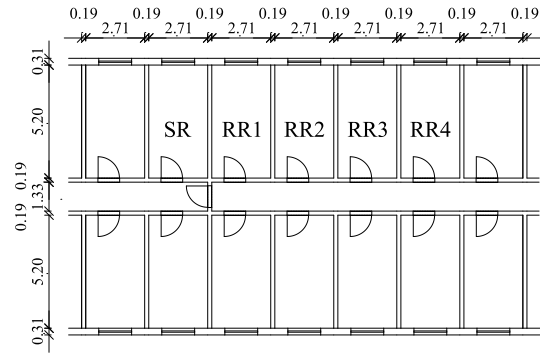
Field test construction: Ground floor plan of the timber-frame building (dimensions in metres).
